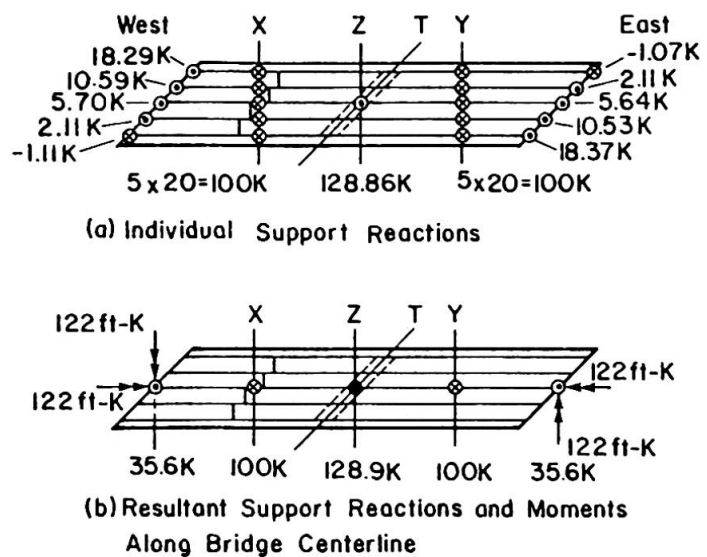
Skew Box Girder Bridge Reactions for Span Loads of 100 kips
